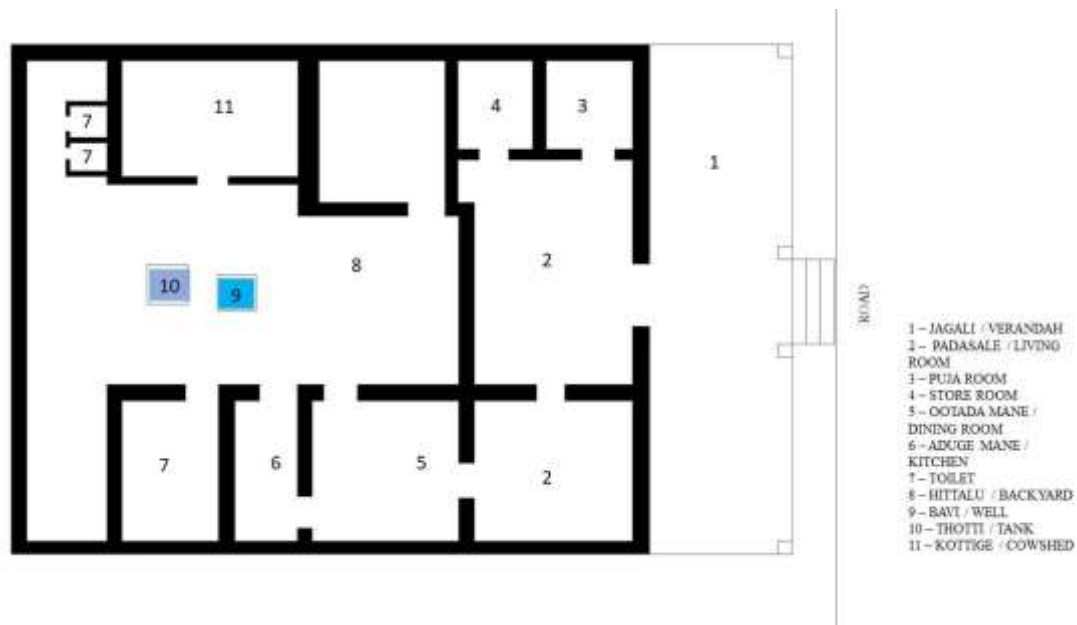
Plan of a typical vernacular house on Raja Beedhi - King's avenue highlighting location of water wells inside the houses (Thotti/tank, bavi/well).
